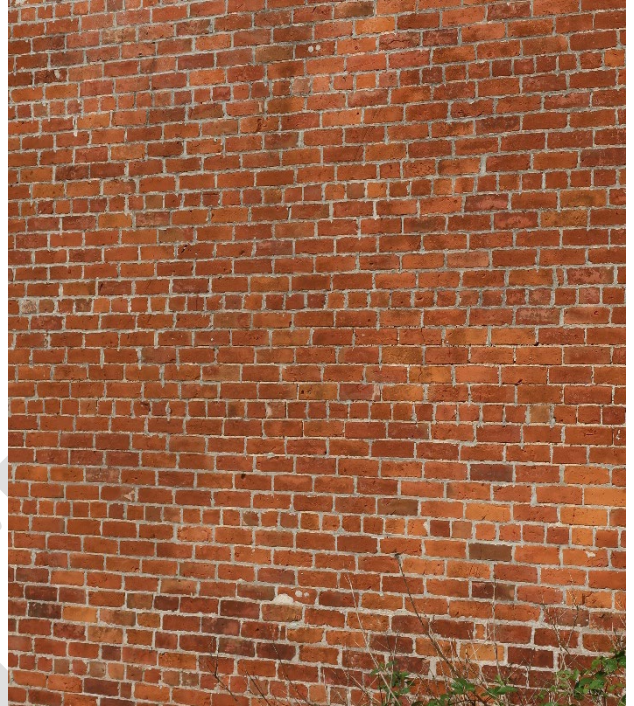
Example of a brick wall laid in common bond with sixth row headers
